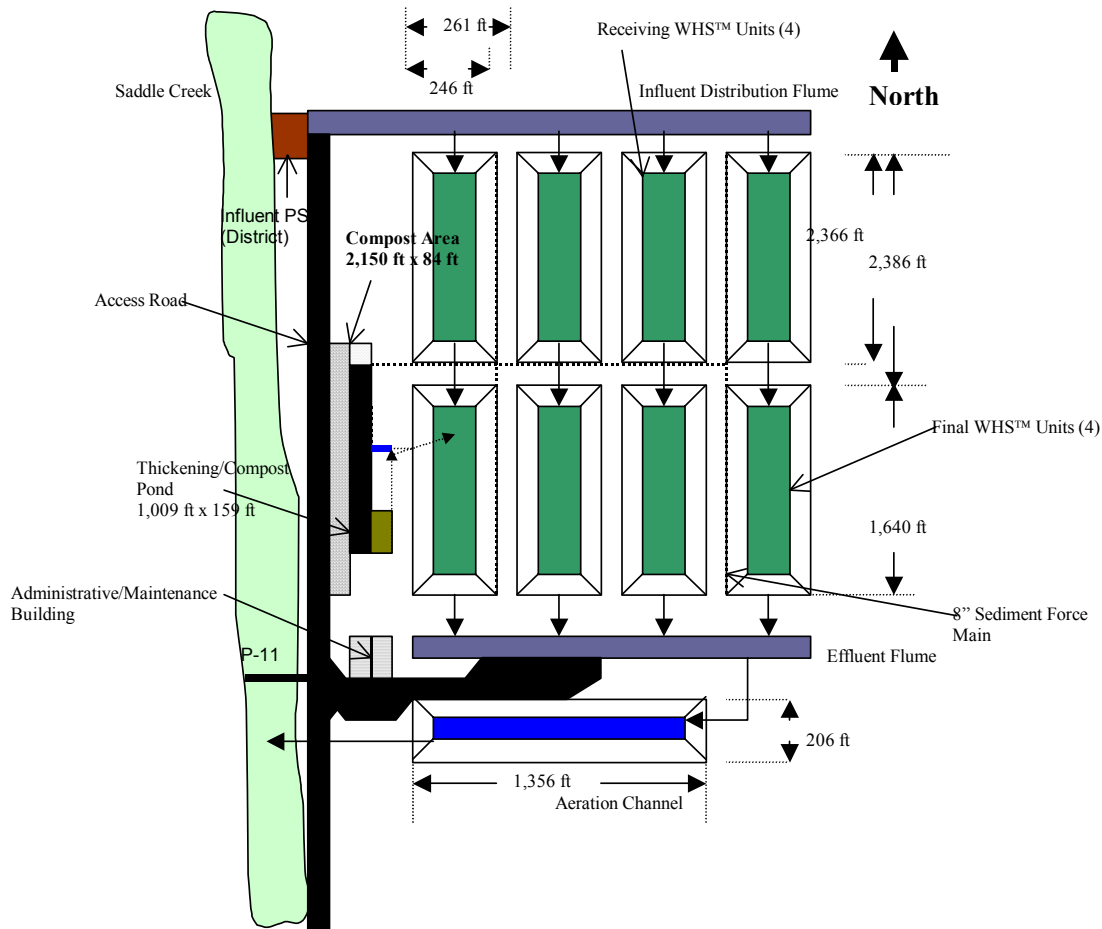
Figure H: General layout proposed Lake Hancock WHS™ Nutrient Recovery Facility: Drawing not to scale (nts)
